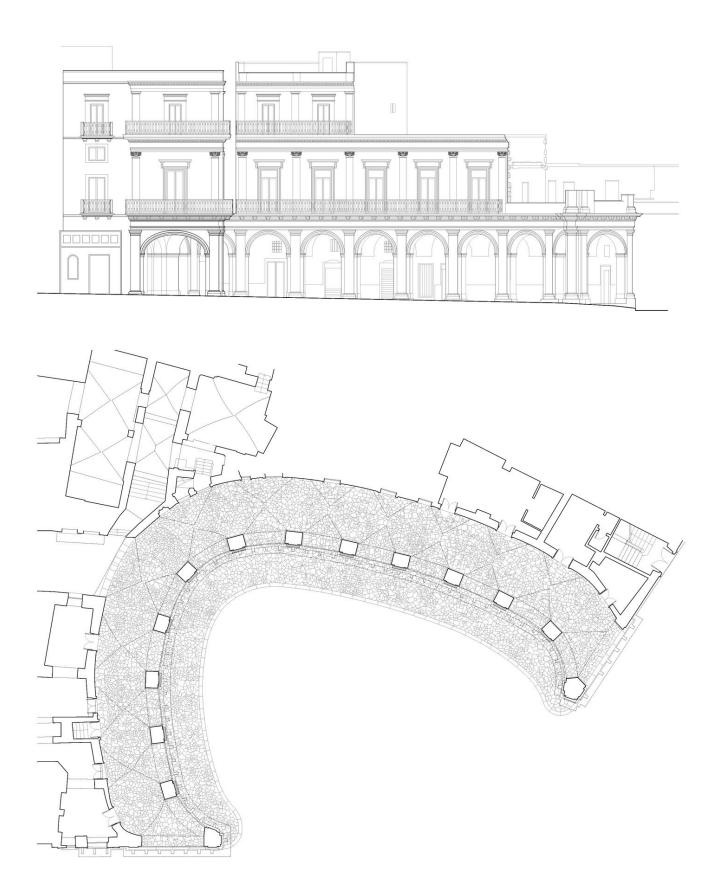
Graphic representation of the northern elevation and ground floor plan. Survey of 2022 (authors' elaboration)
